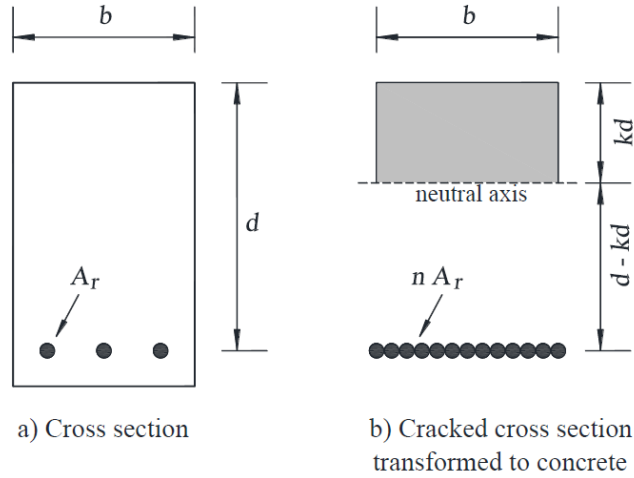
Gross and cracked cross-sections of singly reinforced flexural element.
